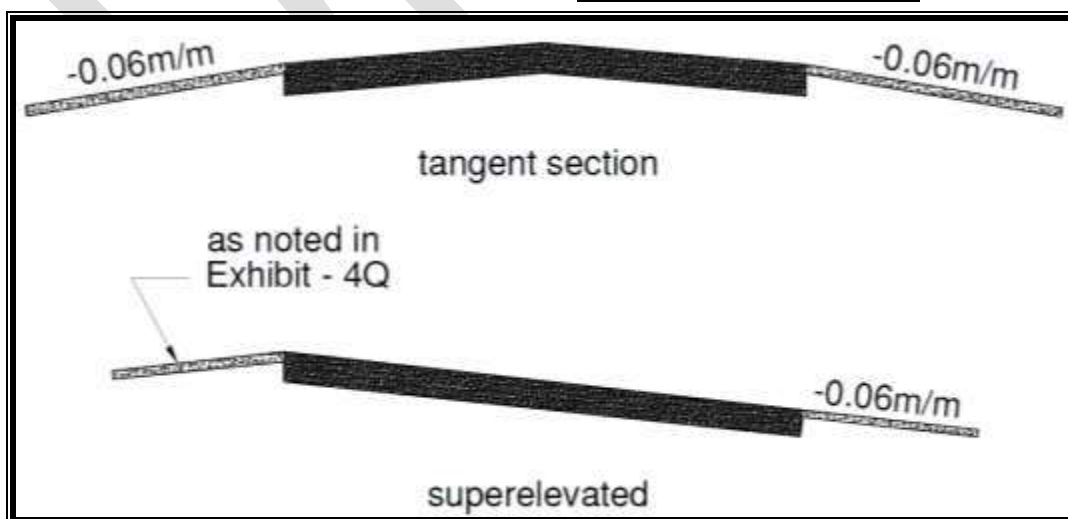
Shoulder Cross Slope and Superelevation
